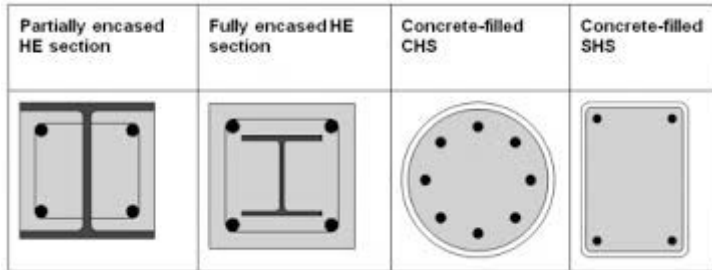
Composite sections (SteelConstruction.info, n.d.)
